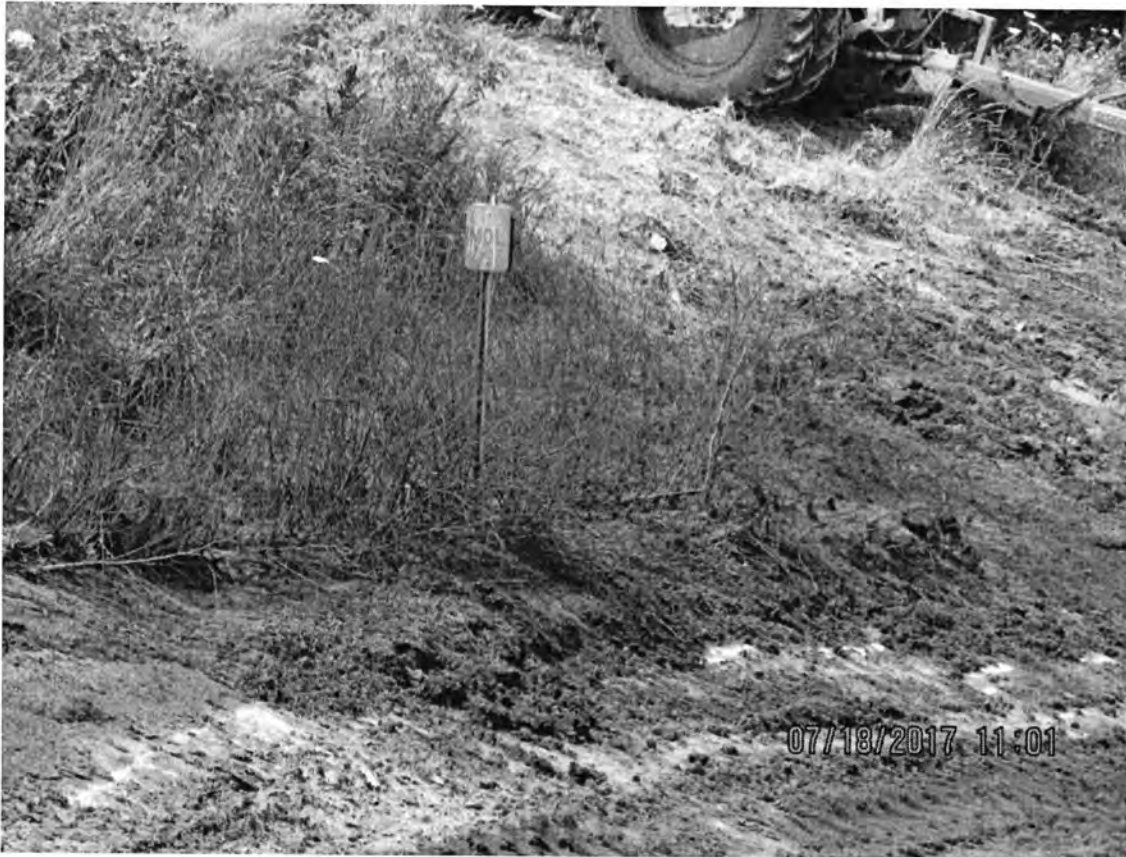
Close up view of the MOL marker in the southern section of outfall/WSF 001. Photo direction is west.
